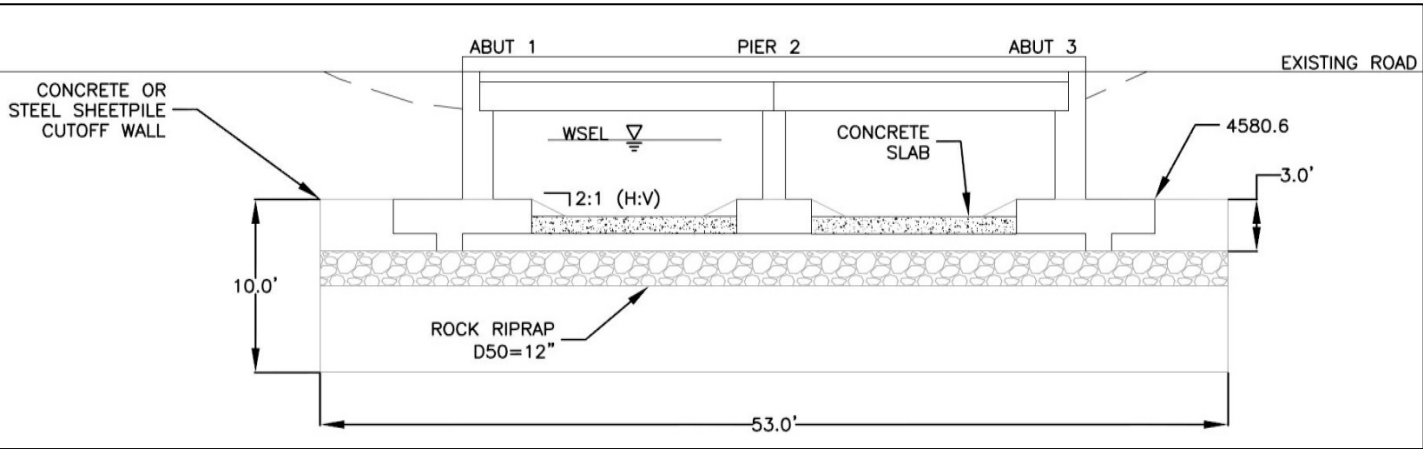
Cross-sectional view of Bridge J-01-D with recommended hydraulic scour countermeasure
